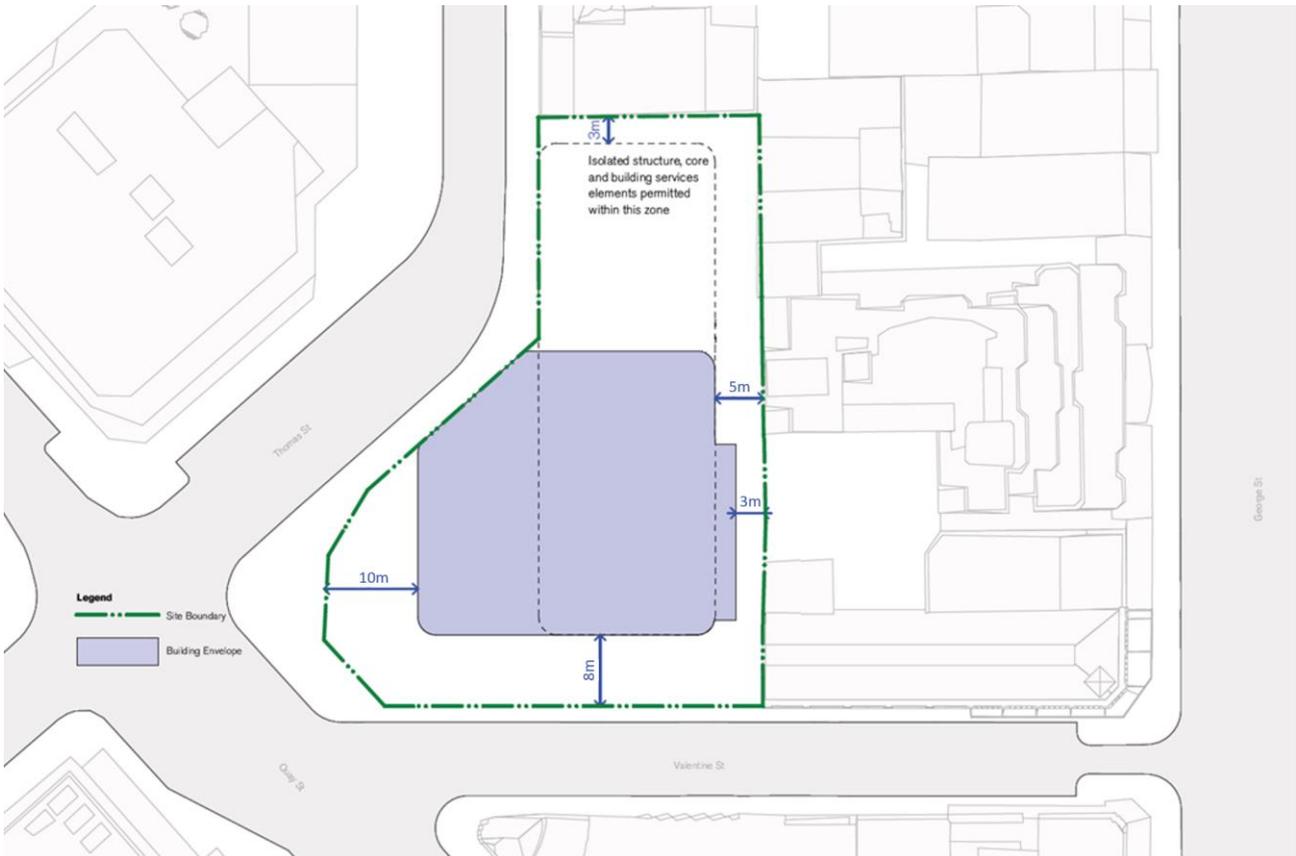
XX 187 Thomas Street, Haymarket – Indicative ground floor layout plan
